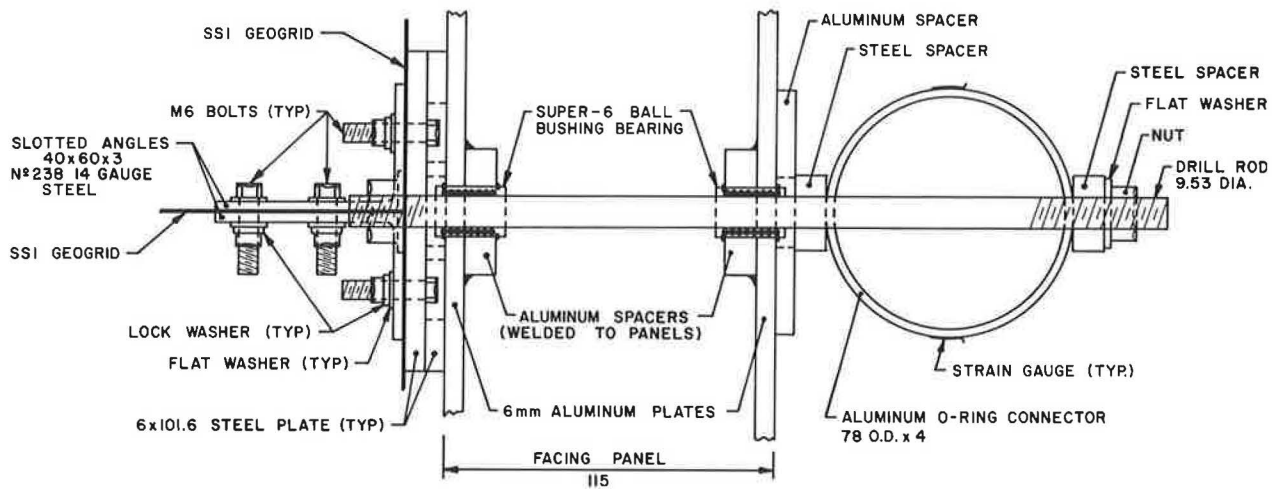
Proving ring arrangement for connection load measurement (all dimensions in mm).
